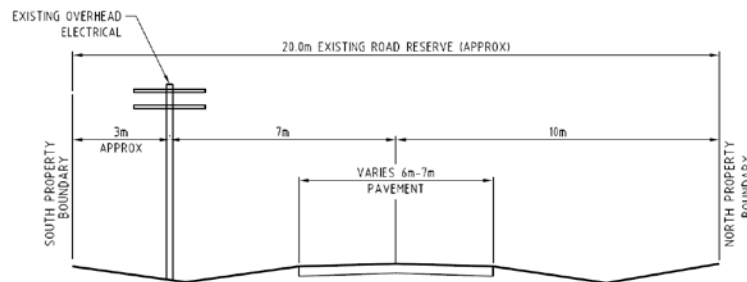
Existing Mountain Ridge Road Typical Section (Approximate)
